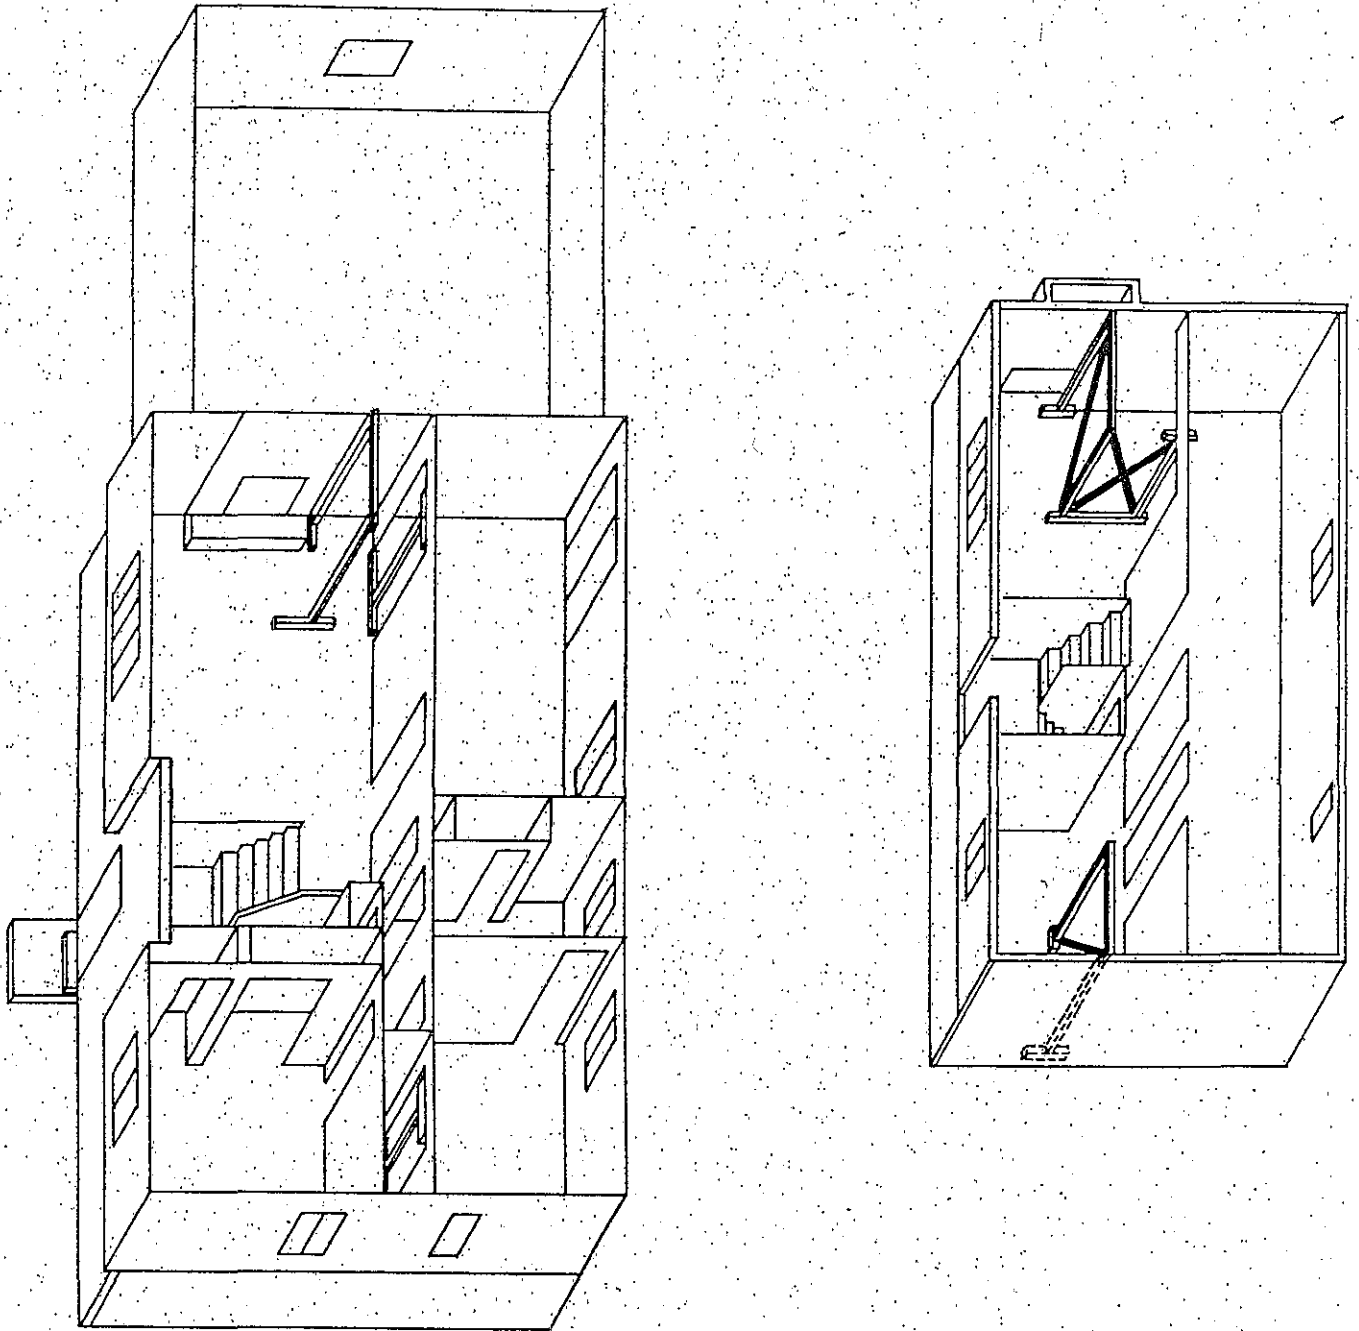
• Structural modifications of main floor and basement to accept shakers. (Modifications shown as darkened features.)
